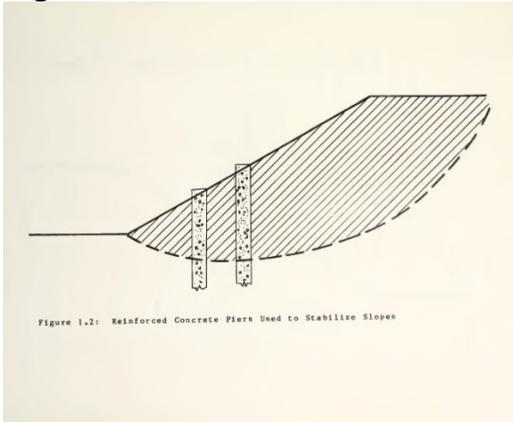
Reinforced Concrete Piers Used to Stabilize Slopes
